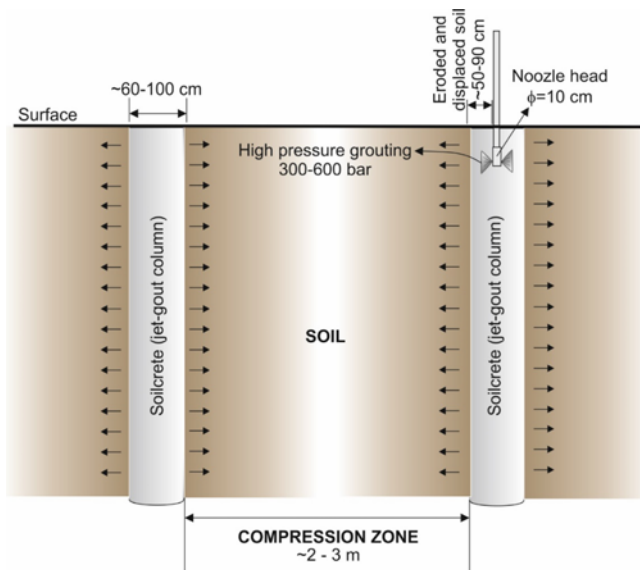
Compressed Soil during High-Pressure Grouting between Jet-Grout Columns
